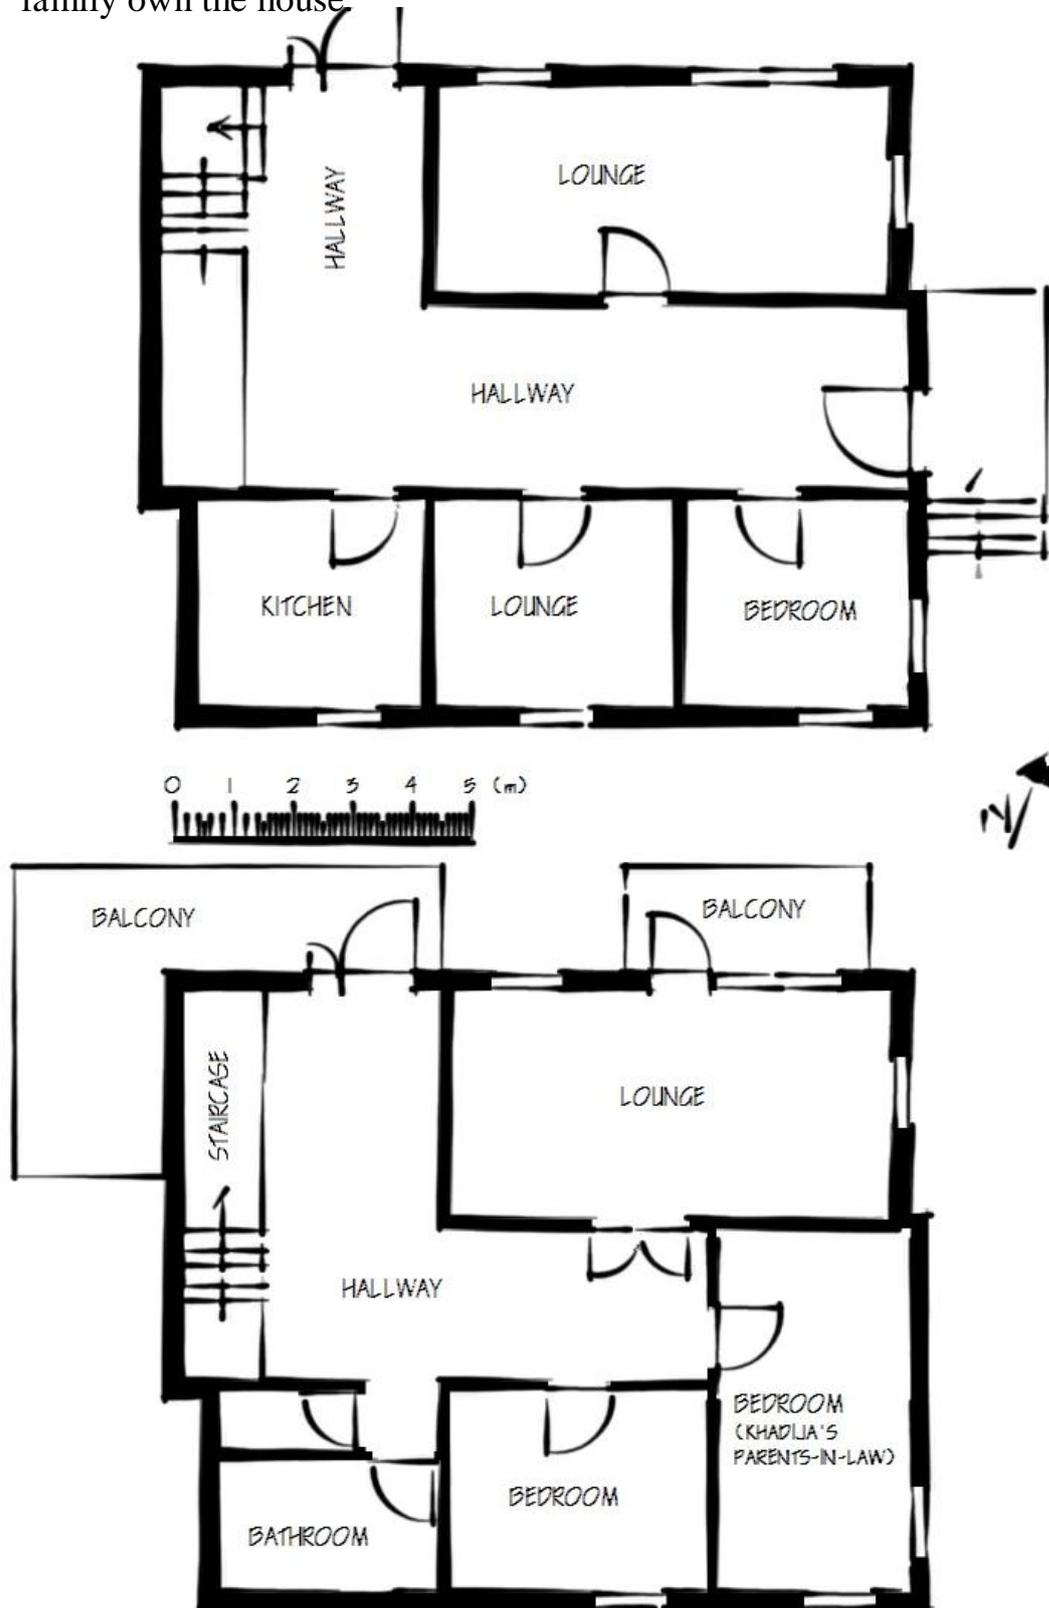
The plan over Khadija and her family's house, on the top the downstairs and on the bottom the upstairs plans.
